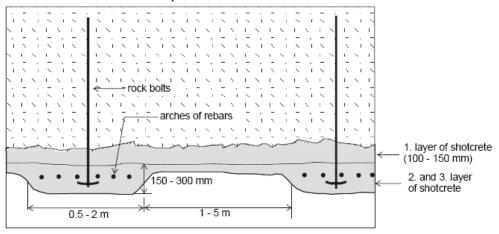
Fault and weakness zone section - reinforced sprayed concrete rib.
